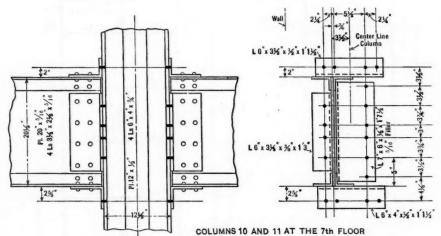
WIND-BRACING DETAIL FOR MEYER-KISER BUILDING.
